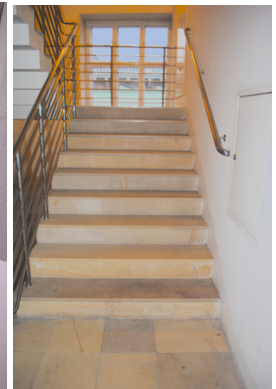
Auxiliary staircase leading to the top floor -S1c
